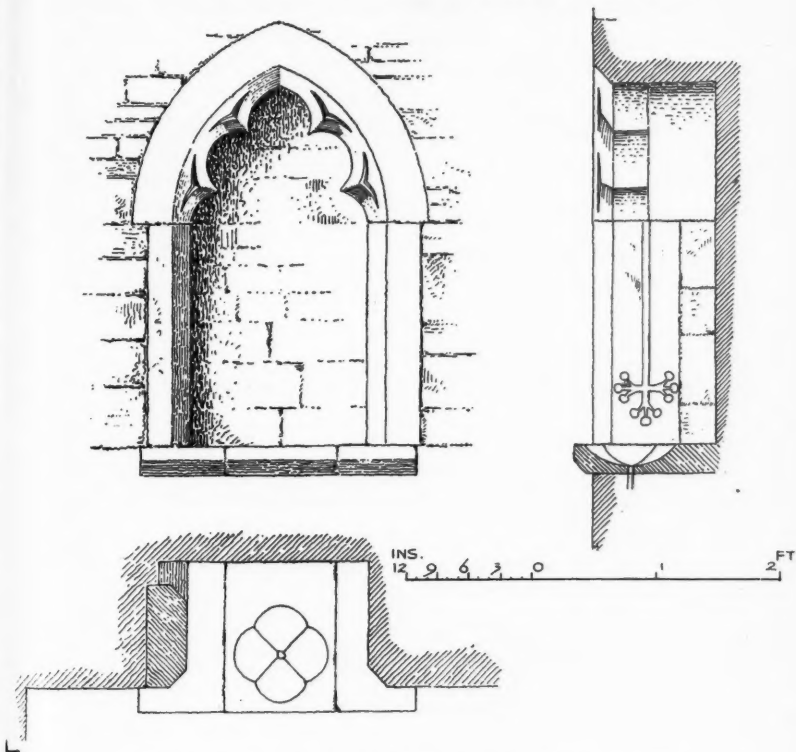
Elevation, Section, and Plan of Piscina in South Wall of Chapel at Llanblethian Church.
